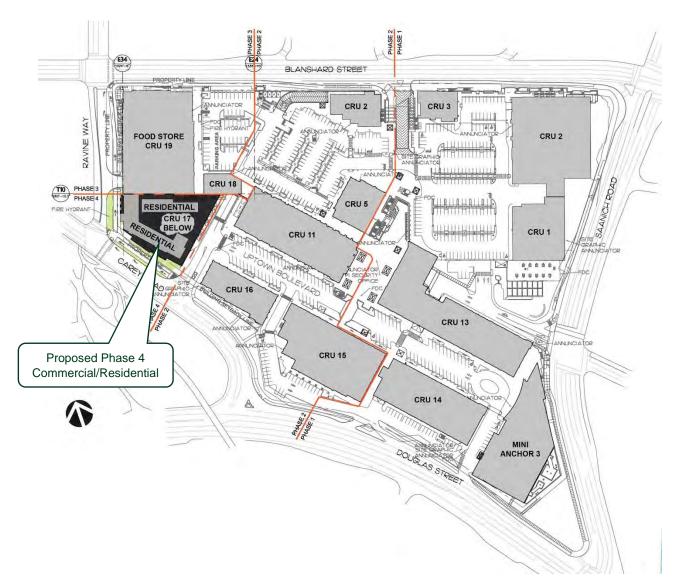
Uptown Shopping Centre Overall Site Plan (from plans by Wensley Architecture Ltd)
